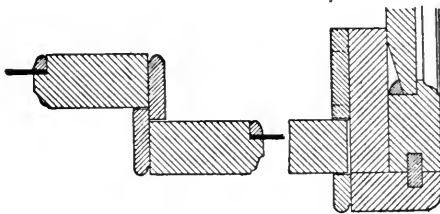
Detail of Sliding Cupboard Doors and Frame.
